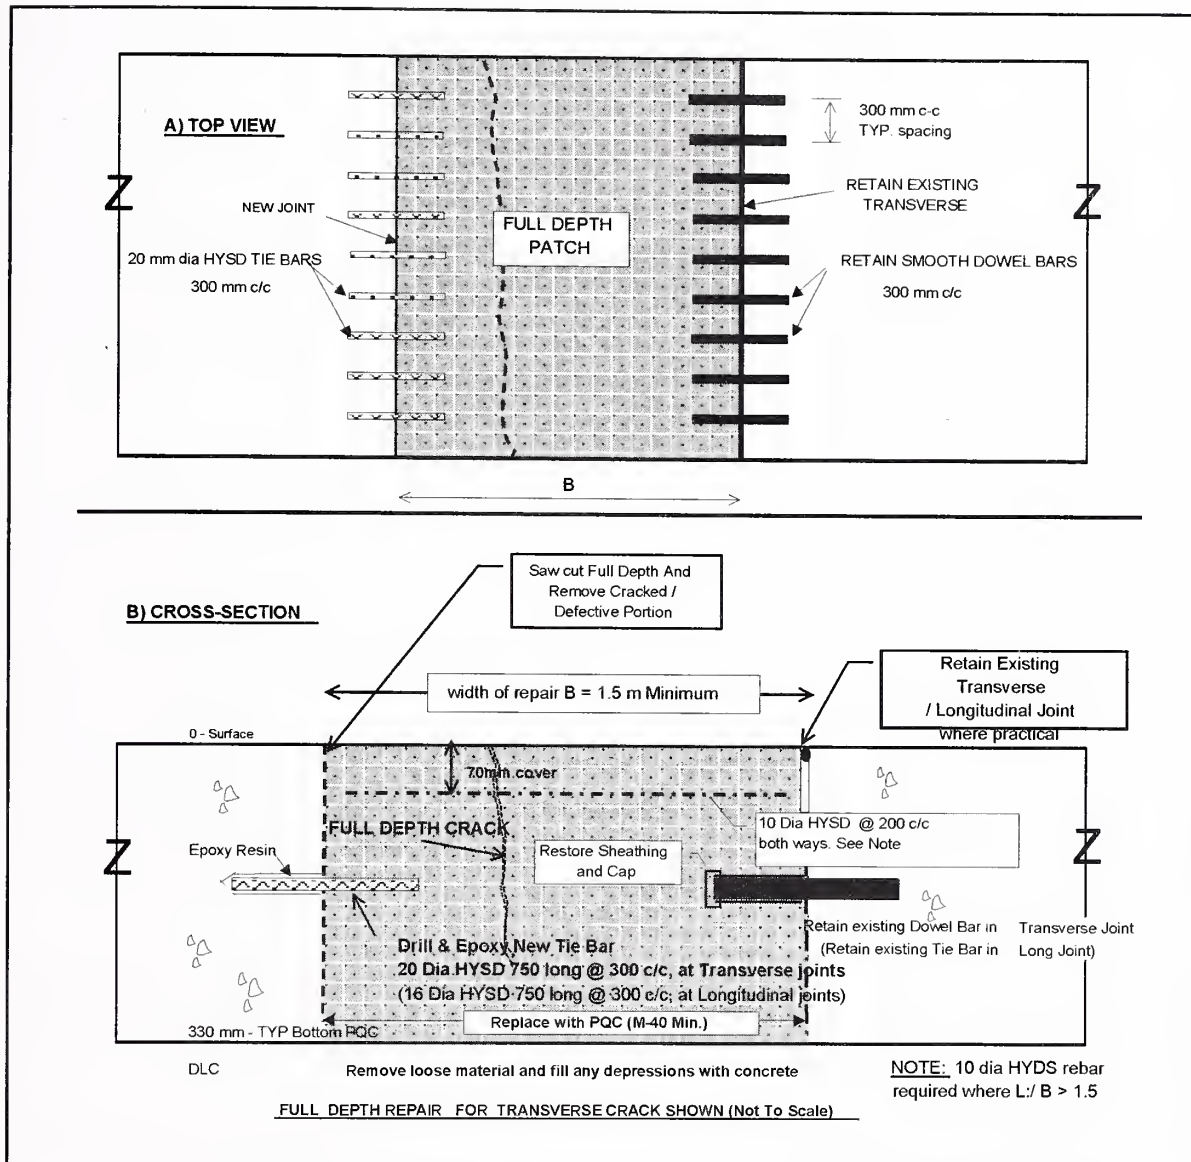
Full Depth Repair of Cement Concrete Pavement
